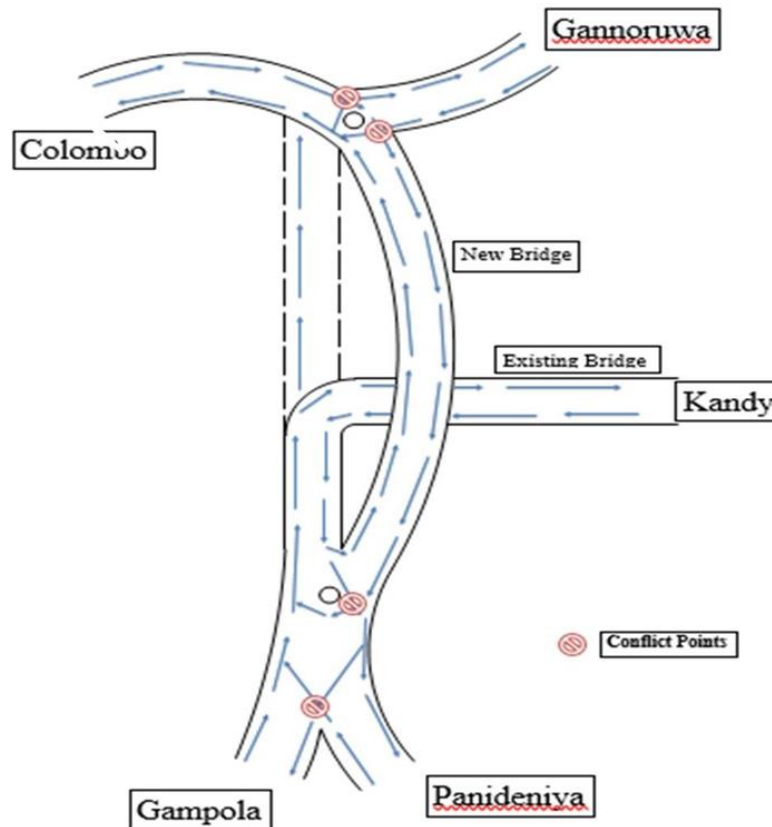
Sketch showing the new bridge, existing bridge and traffic directions in alternative 5
